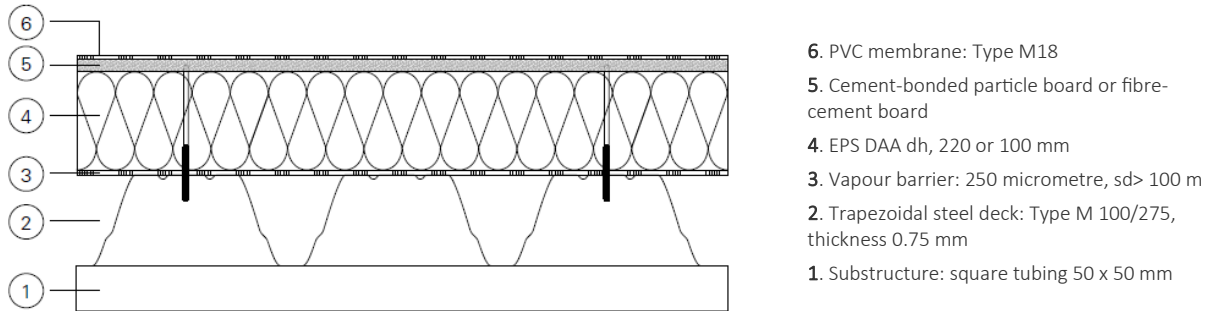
Cross-section of the roof structure – Lightweight industrial roof construction with EPS rigid foam and cement-bonded particle board (layer 5) beneath the PVC waterproofing membrane.
